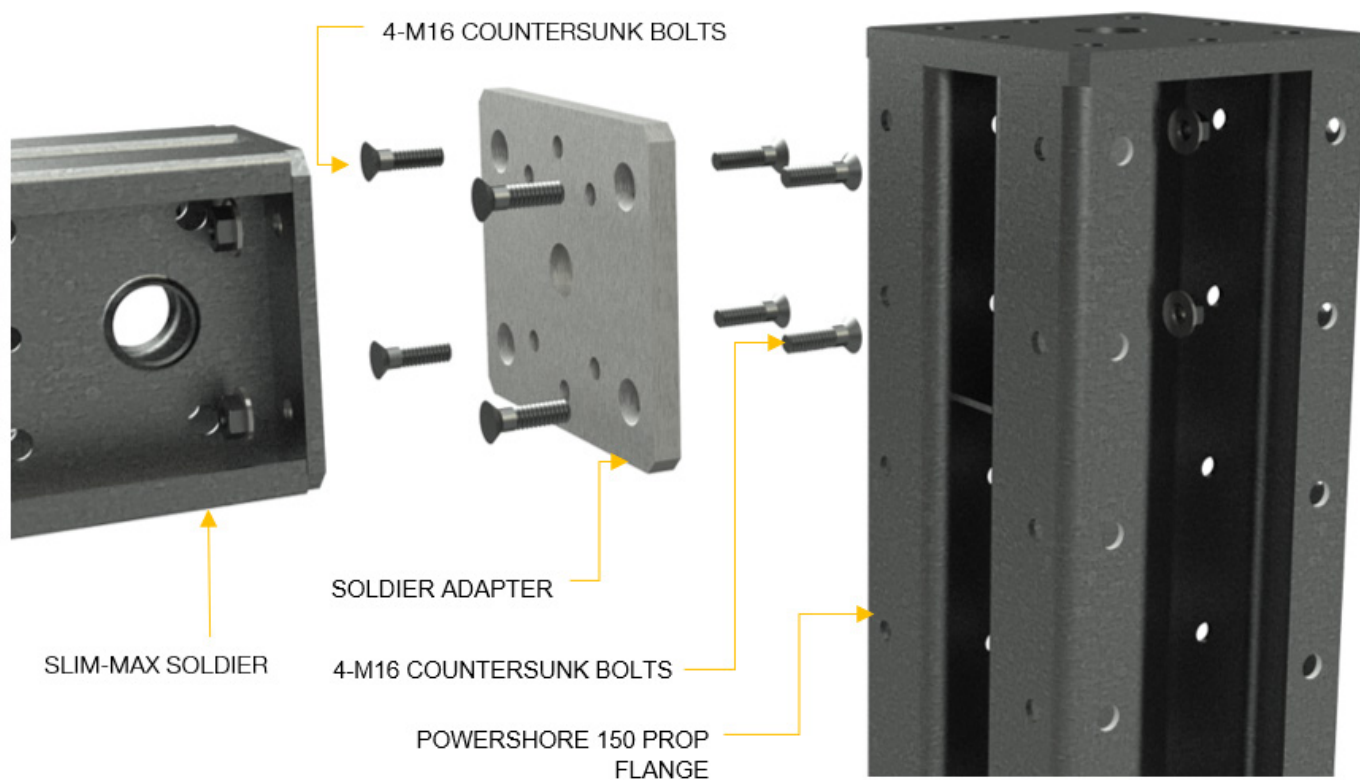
DETAILED VIEW OF BOLT CONNECTION USING SOLDIER ADAPTER
